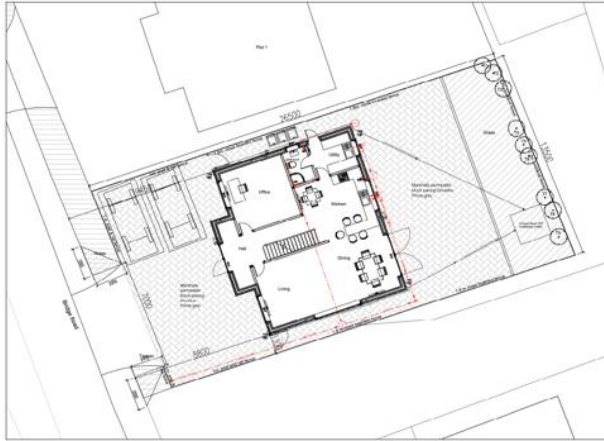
Proposed Site Plan, showing soft & hard landscaping
